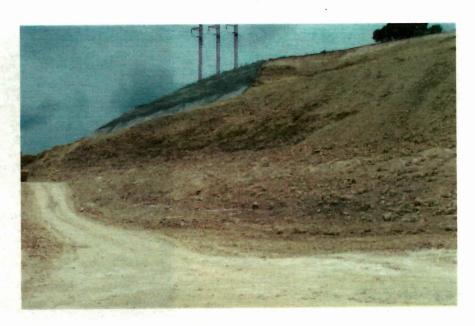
View of areas without soil stabilization and concrete slabs along the project.
